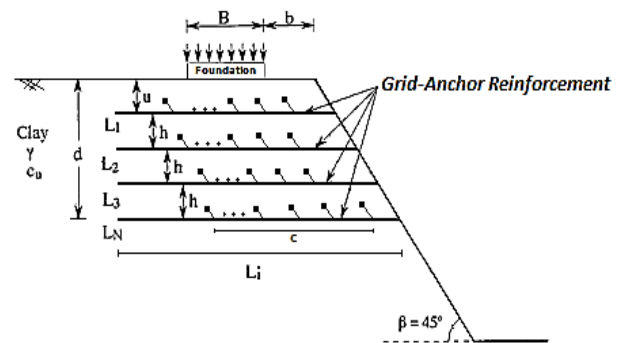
Schematic view of a reinforced slope with the grid anchor system
